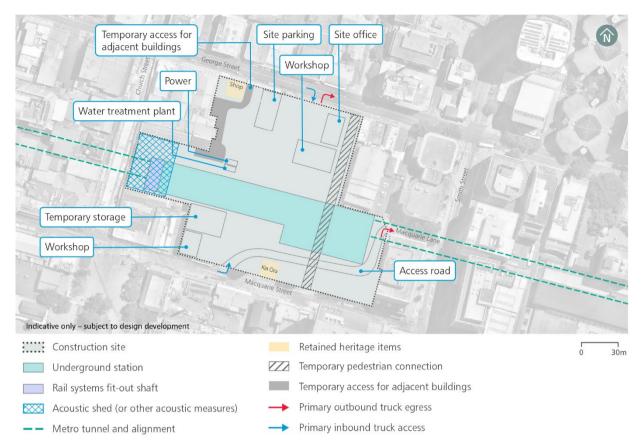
Exhibited indicative construction site layout - Parramatta metro station (Figure 8-9 of the Environmental Impact Statement)
